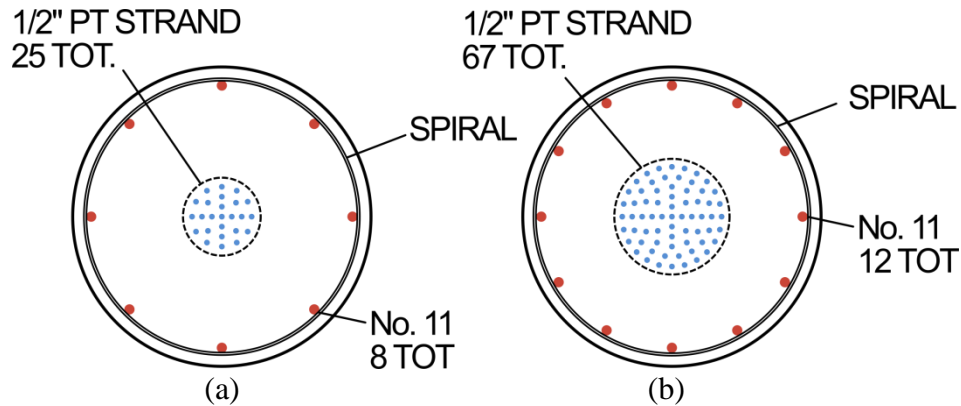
Column cross sections for design point (a) Pier 4 (b) Pier 7
